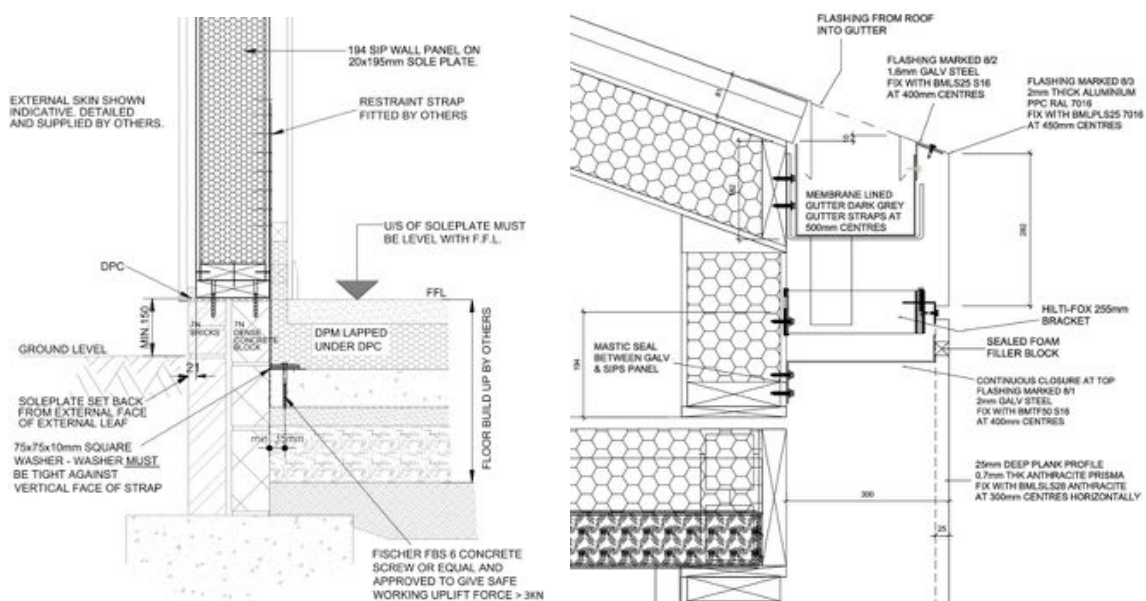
Construction details of the EPH design. Left: Detail of the sole plate, floor slab and foundations. Right: Detail of the eaves in the southern elevation.
